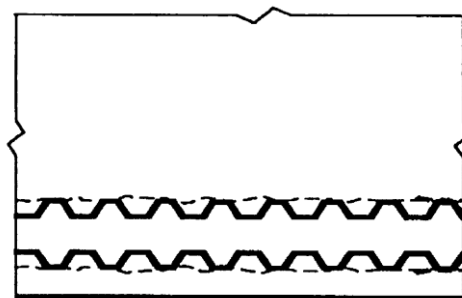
shear crack and/or local concrete crushing caused by bar pull-out in side view, [83]
